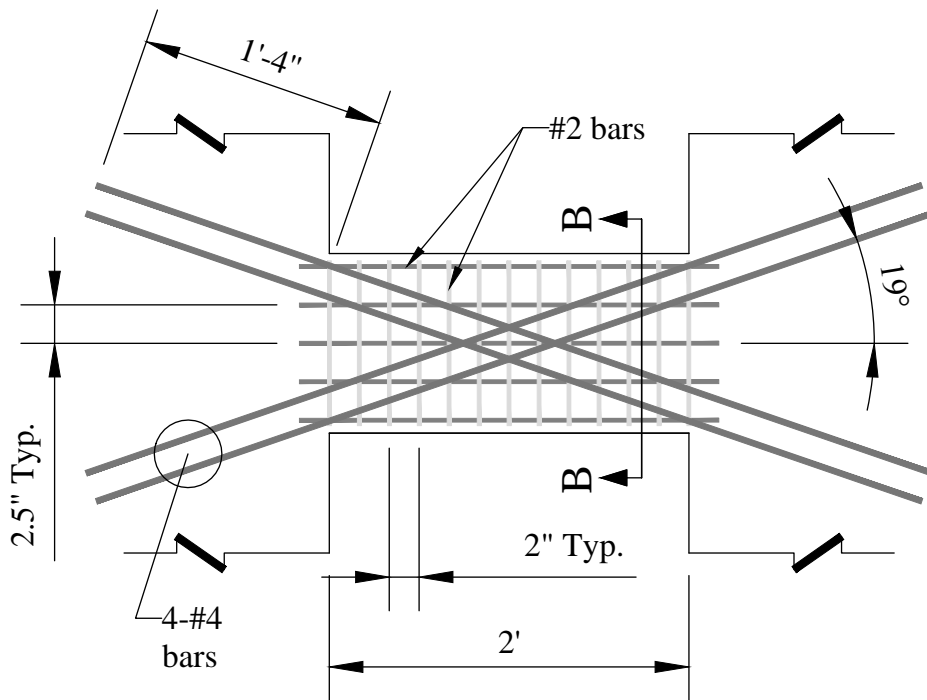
Specimen CW1 reinforcement layout (elevation view)
